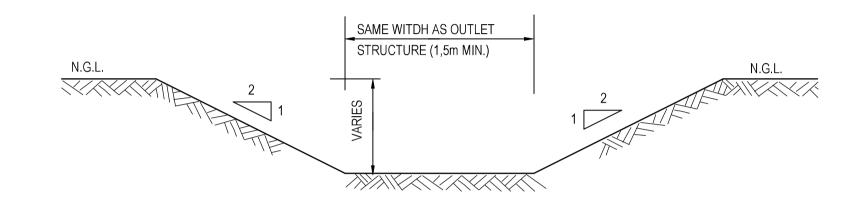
DETAIL : IN- OR OUTLET STRUCTURE. SCALE 1: 20
